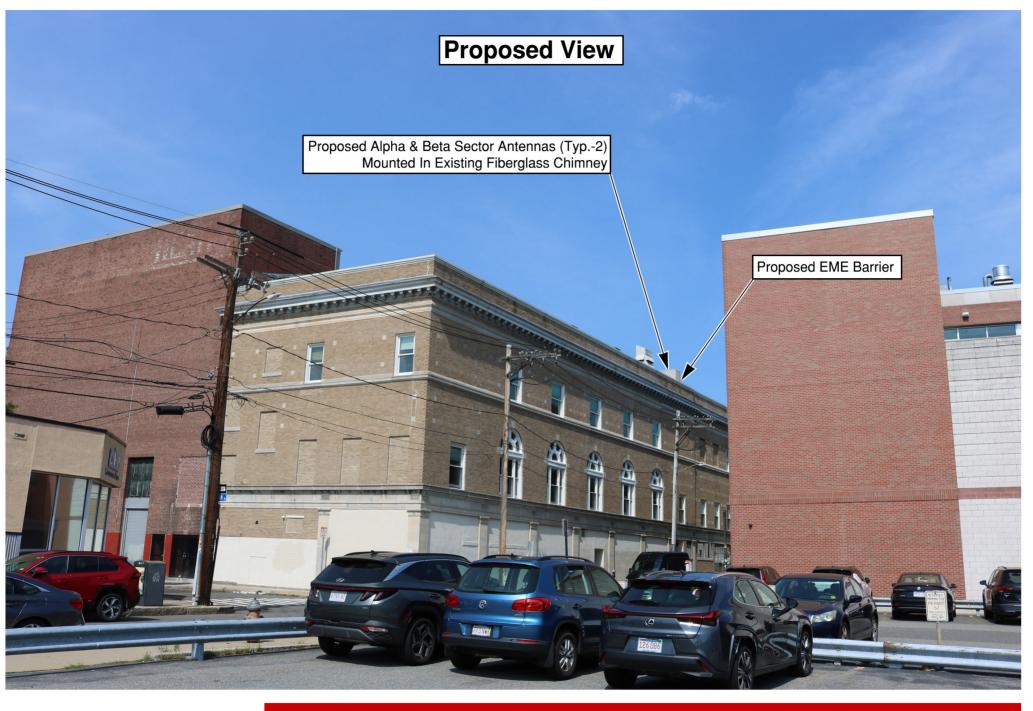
B View Facing Northeast Off Of Dover Street (Page 8 of 8)
